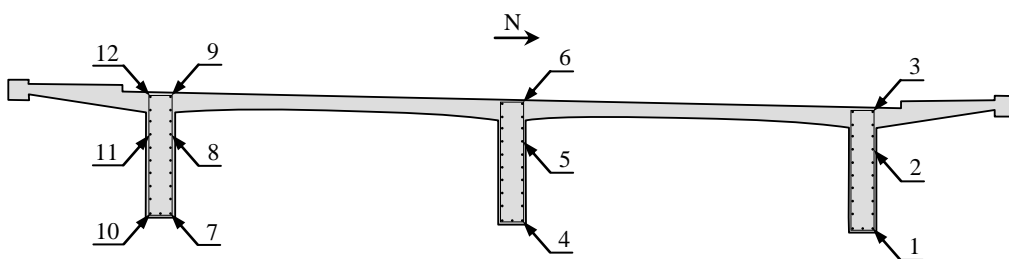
Cross-section positions of strain gauges on longitudinal reinforcing steel.
